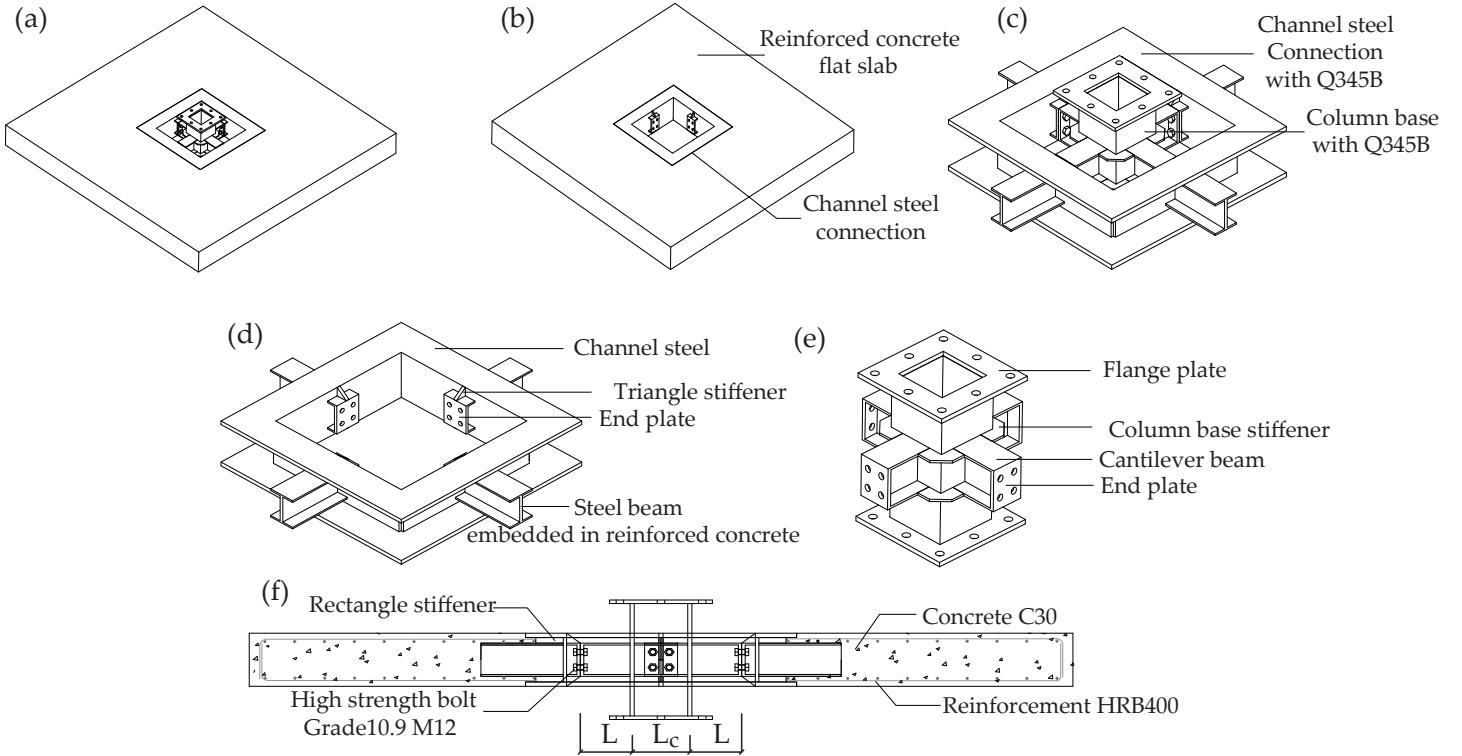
Configuration of prefabricated reinforced concrete flat slab to square steel tube column connection (Zhang et al., 2018): a) Slab-column connection; b) Reinforced concrete flat slab and channel steel section; c) Column base connection; d) Channel steel connection; e) Column base; f) Connection cross-section.
